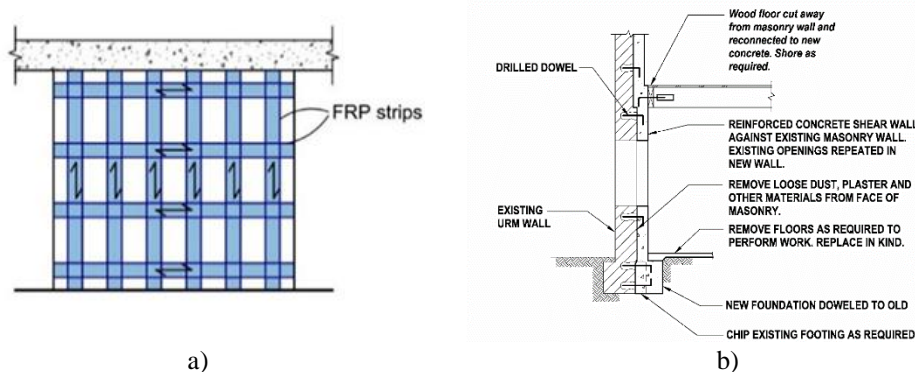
Techniques for seismic retrofitting of masonry walls: a) thin overlays – FRP strips [22] and b) thick overlay (new RC shear wall) [38].
